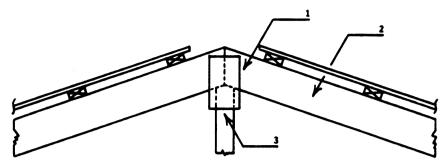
Location of test sites, Barn A. Truss No. 1, 6.1m (20') from north end. South elevation. Molded flashing not shown.
